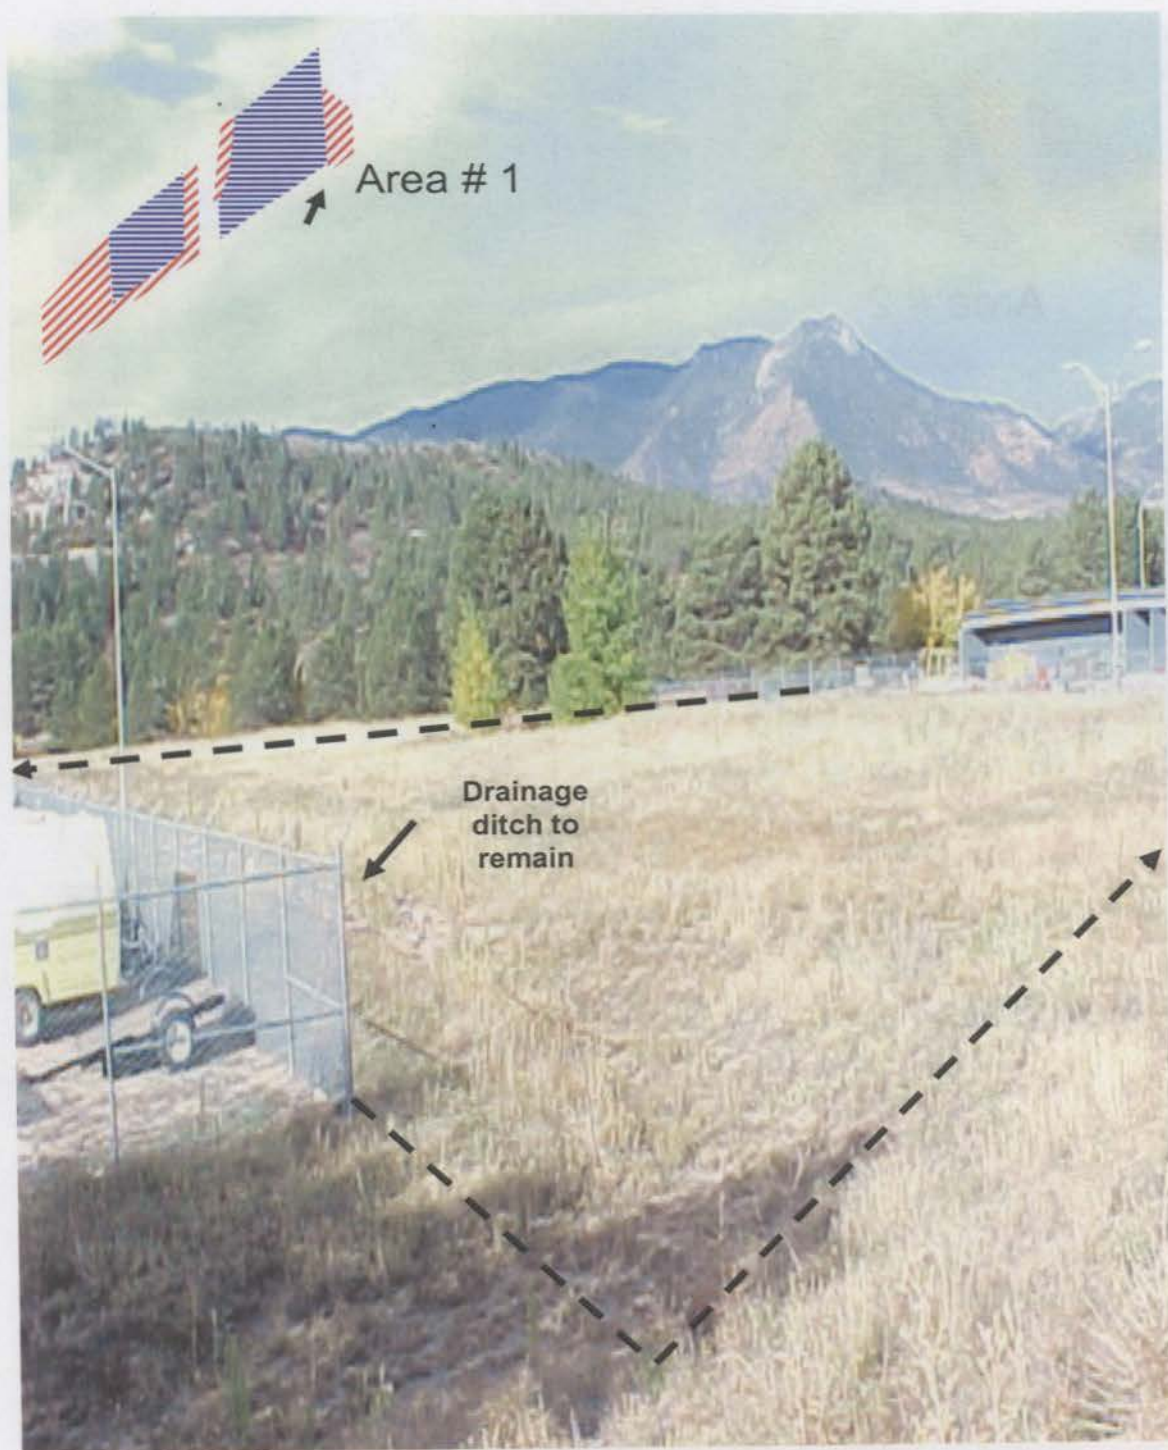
Proposed Expansion Area No. 1 Looking Northwest
